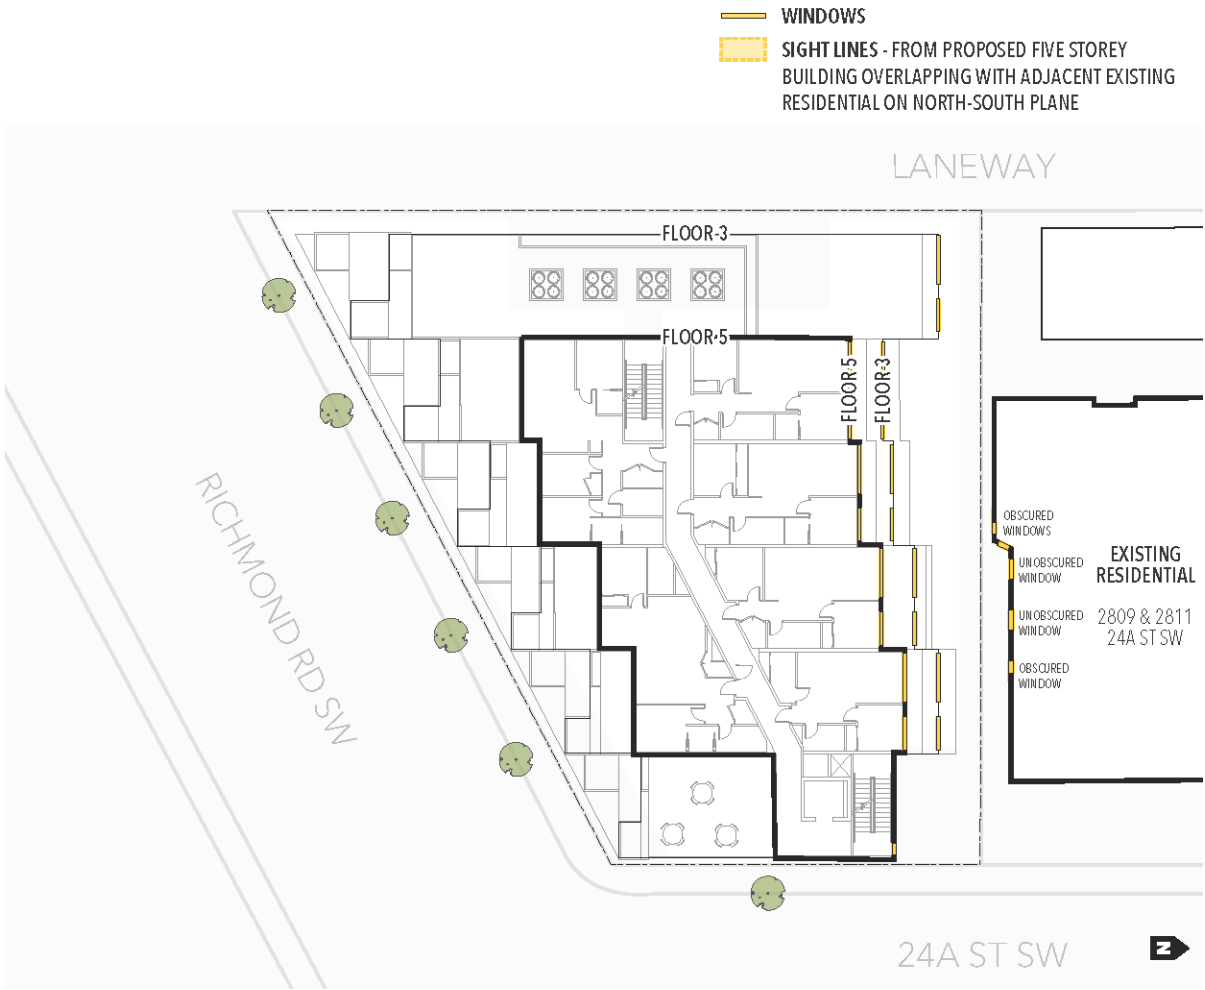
FLOOR 5 PLAN | FLOORS 3 & 5 WINDOWS
